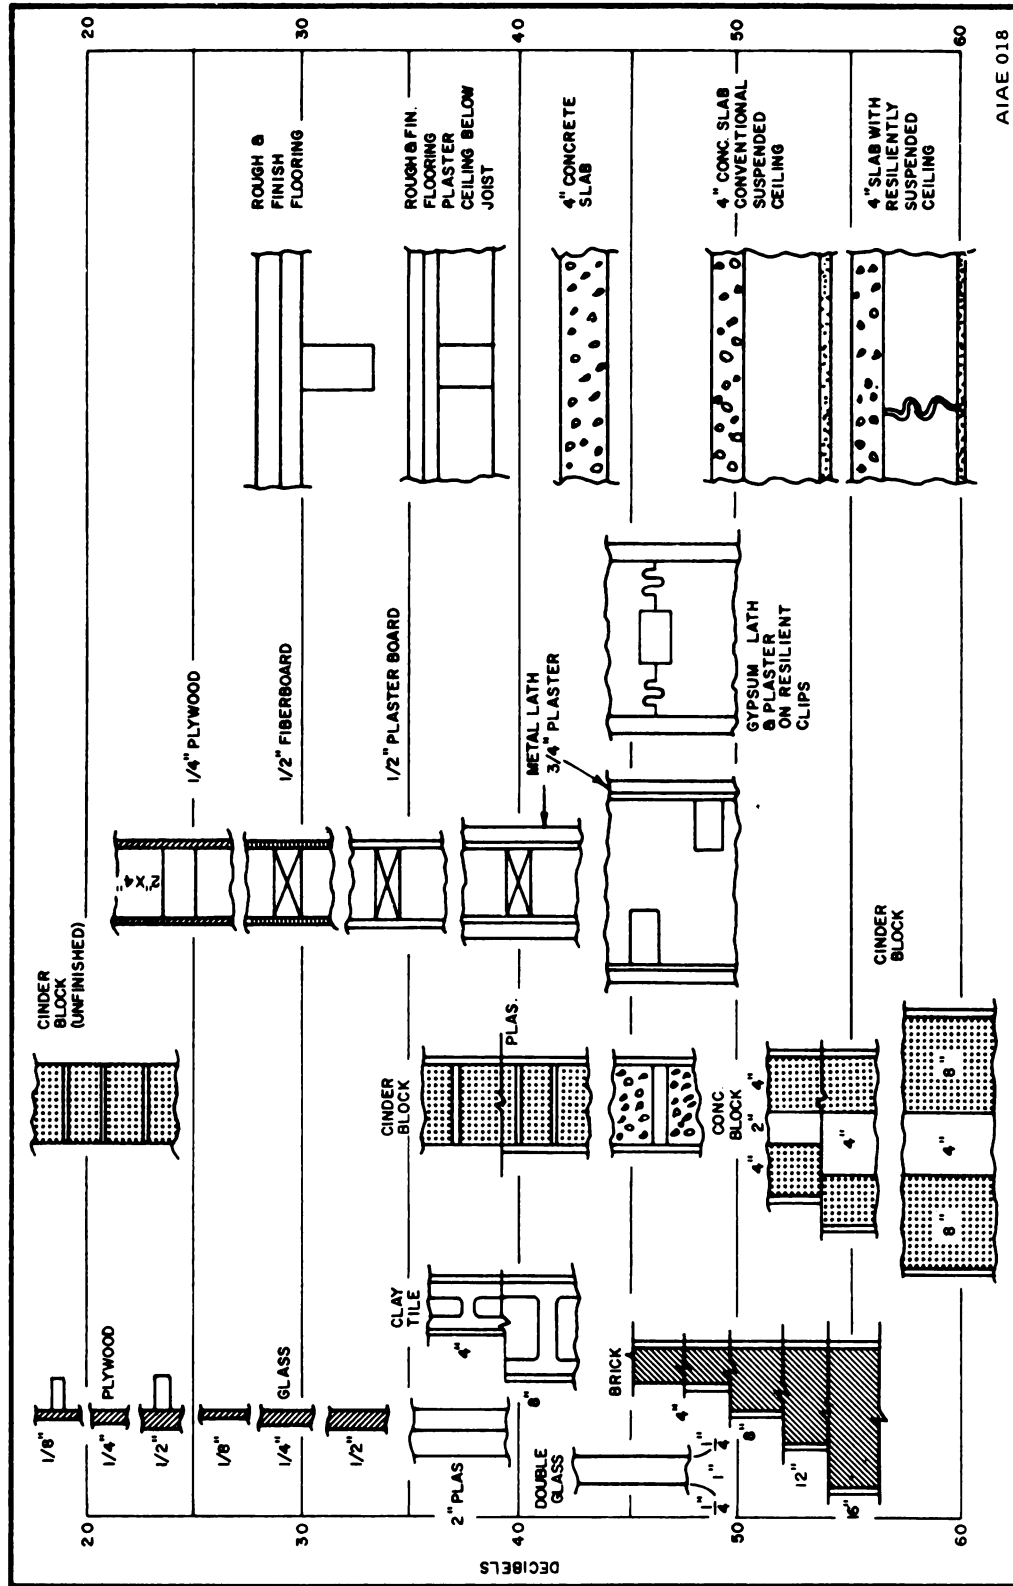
Estimated Average Sound Transmission Loss of Typical Wall and Floor Construction
